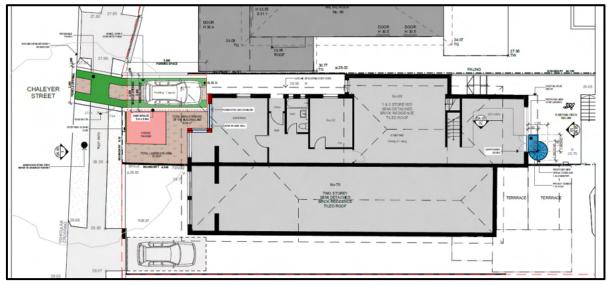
Floor plan submitted in the refused original development (DA-219/2021)
